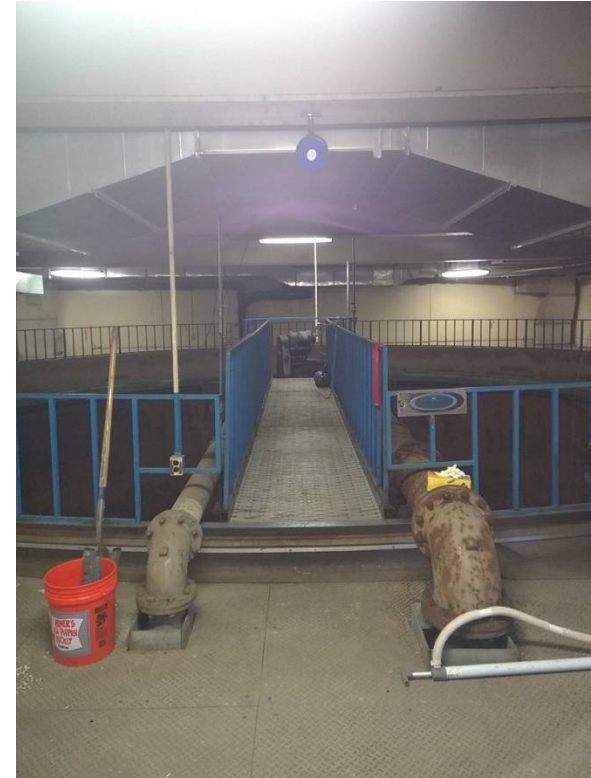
Center Column of Thickener No. 1, looking South at locations 1 and 16 thru 20.
